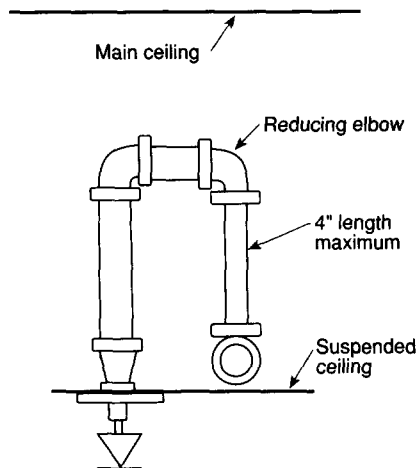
(a) Nipple and reducing elbow supplying sprinkler below ceiling.
